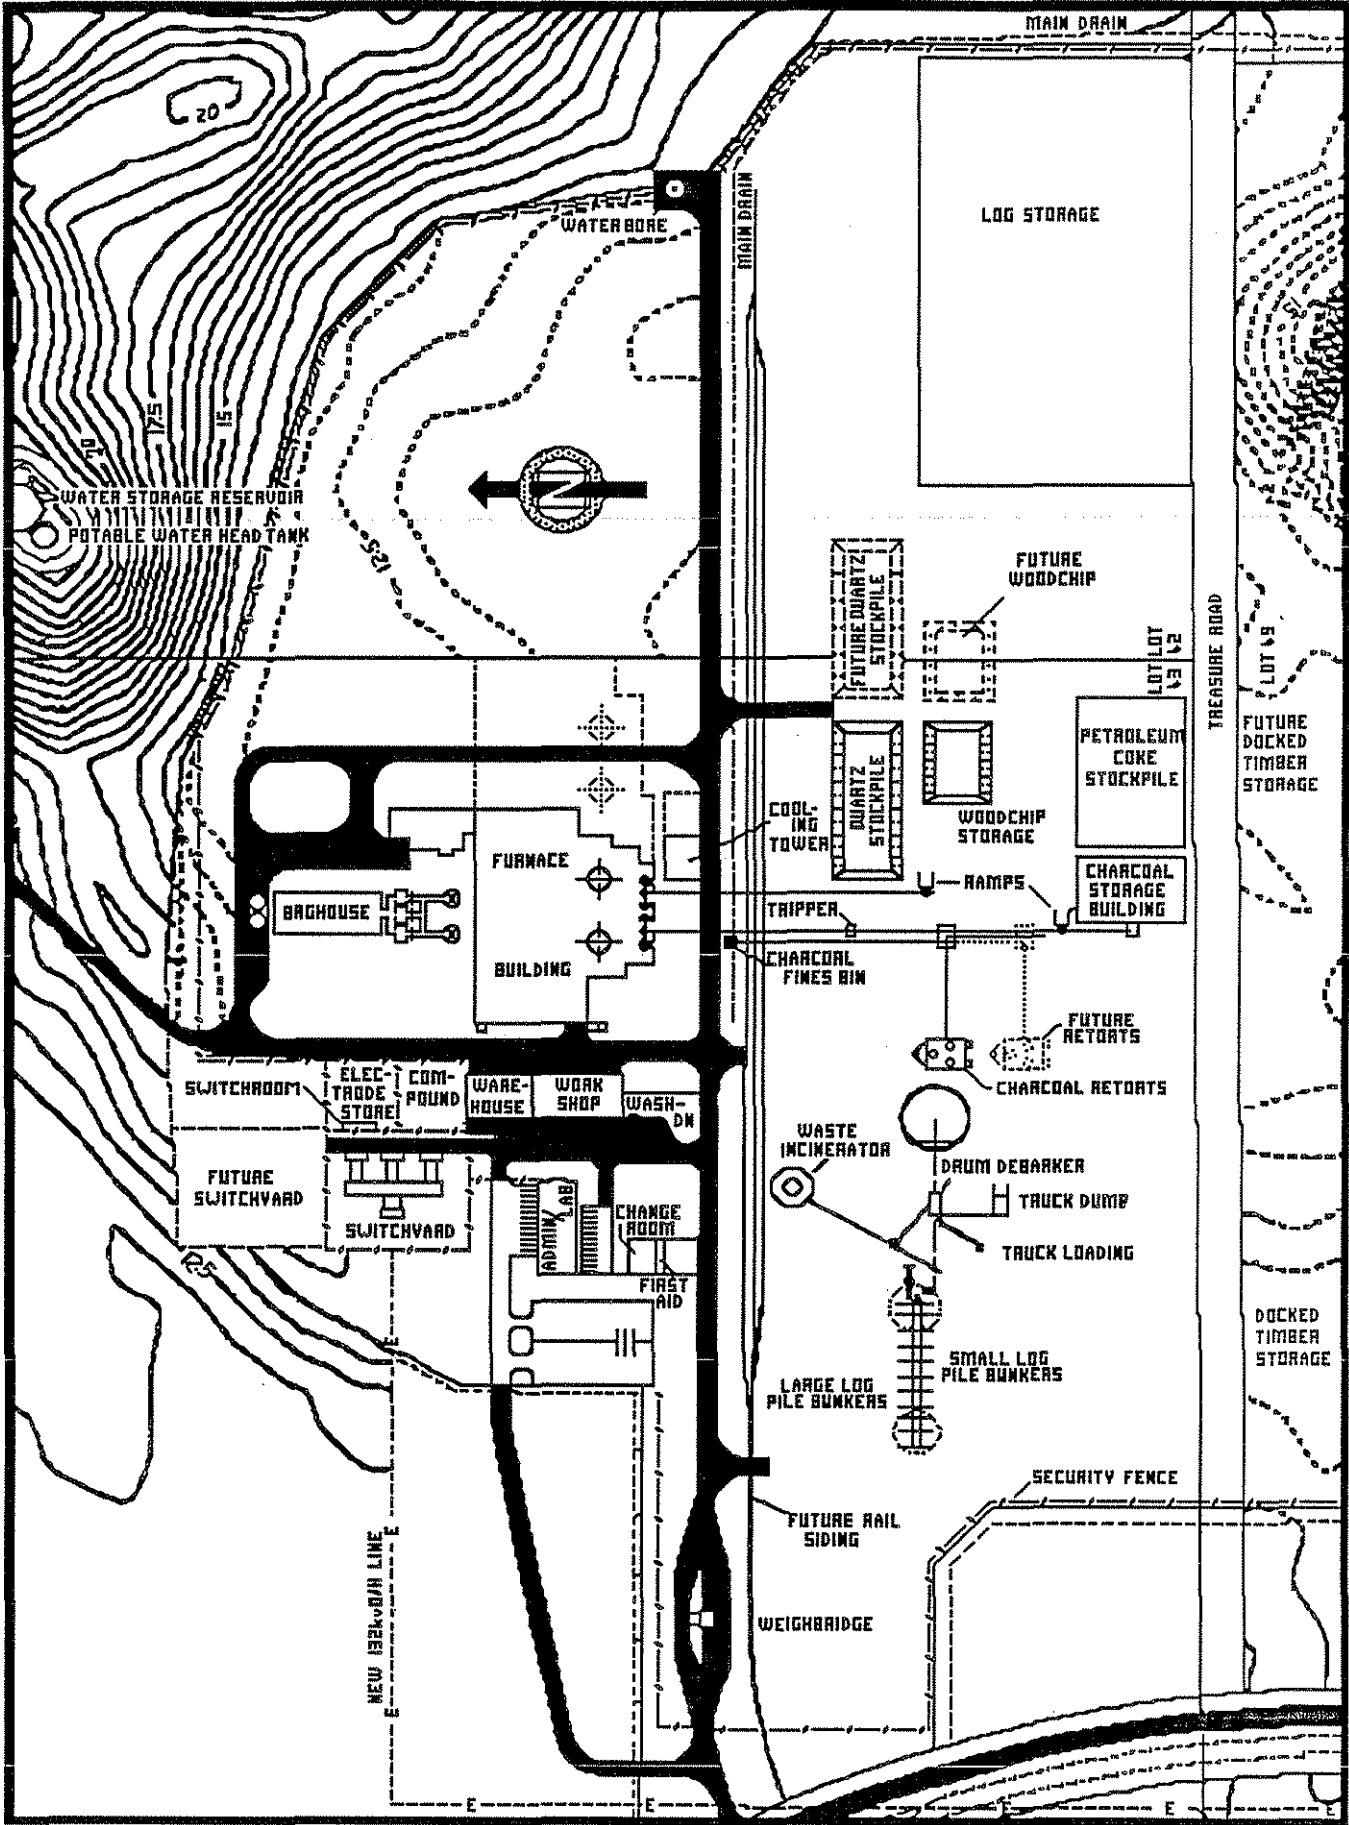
Barrack Silicon Smelter Site Plan for Picton Site
